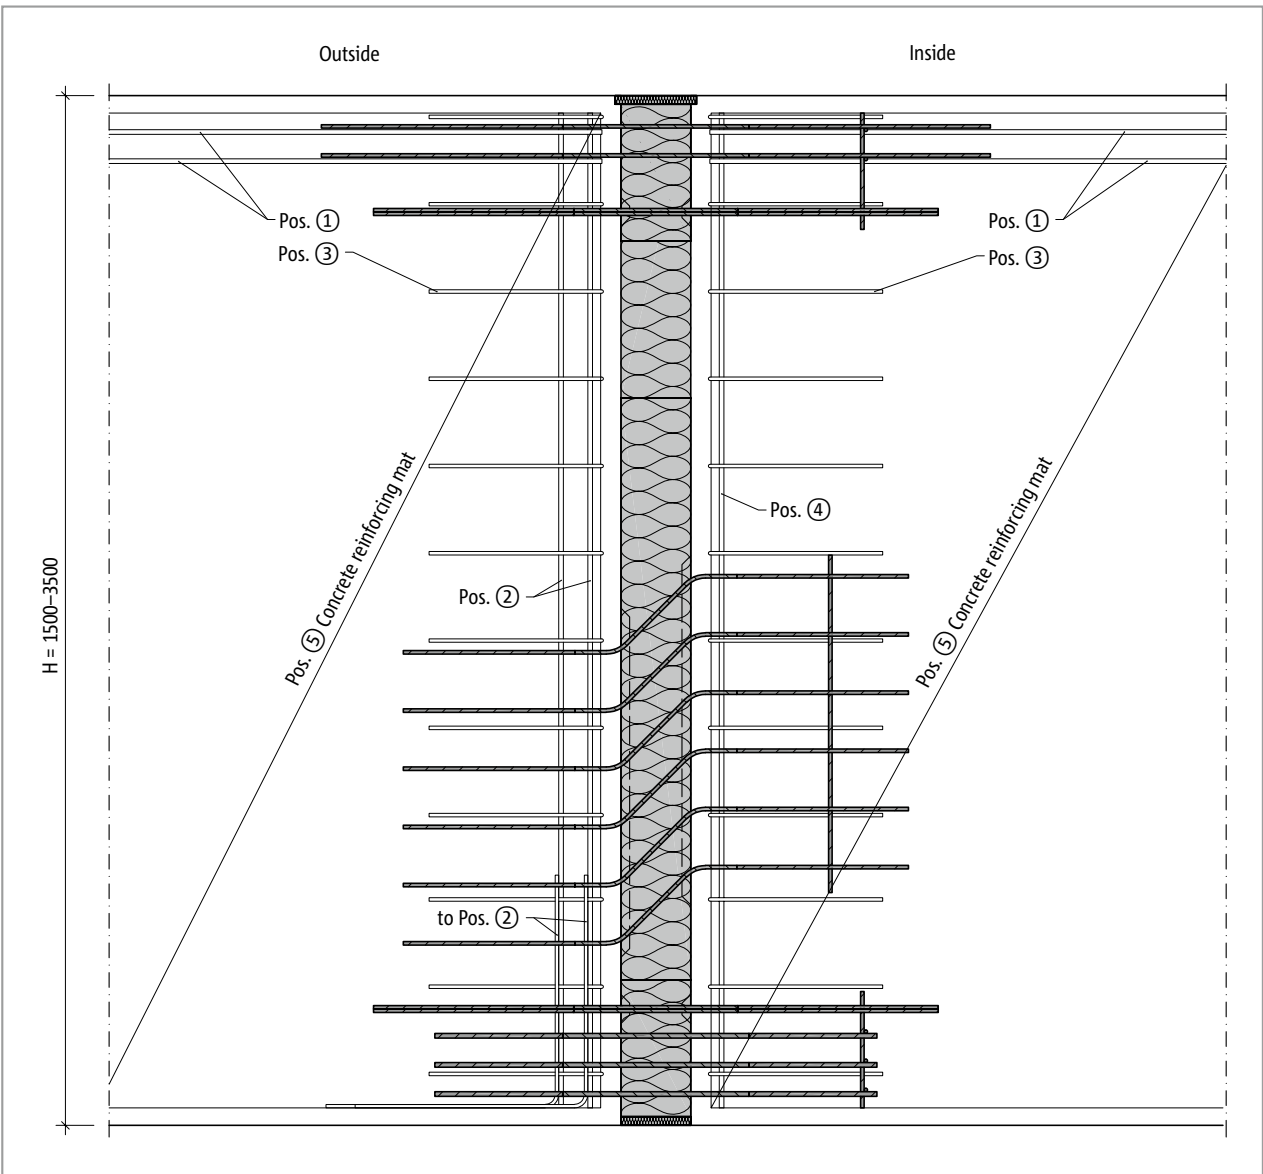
Schöck Isokorb® XT type W: On-site reinforcement; section
